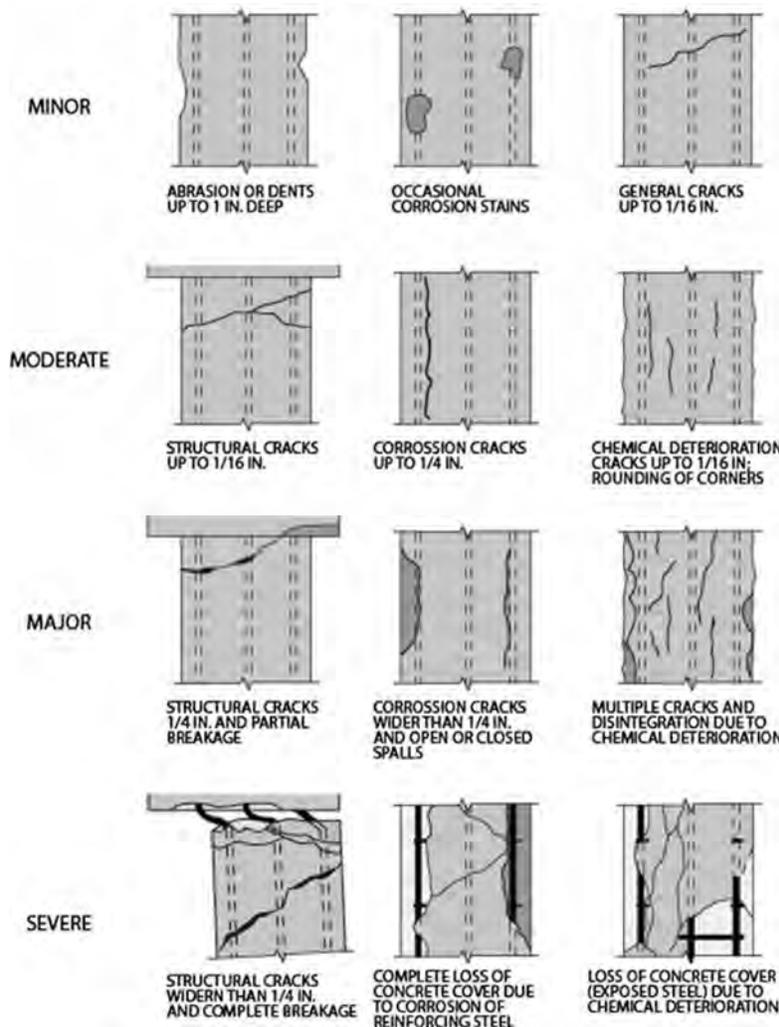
Damage Ratings for Reinforced Concrete Elements, per ASCE MOP 130
